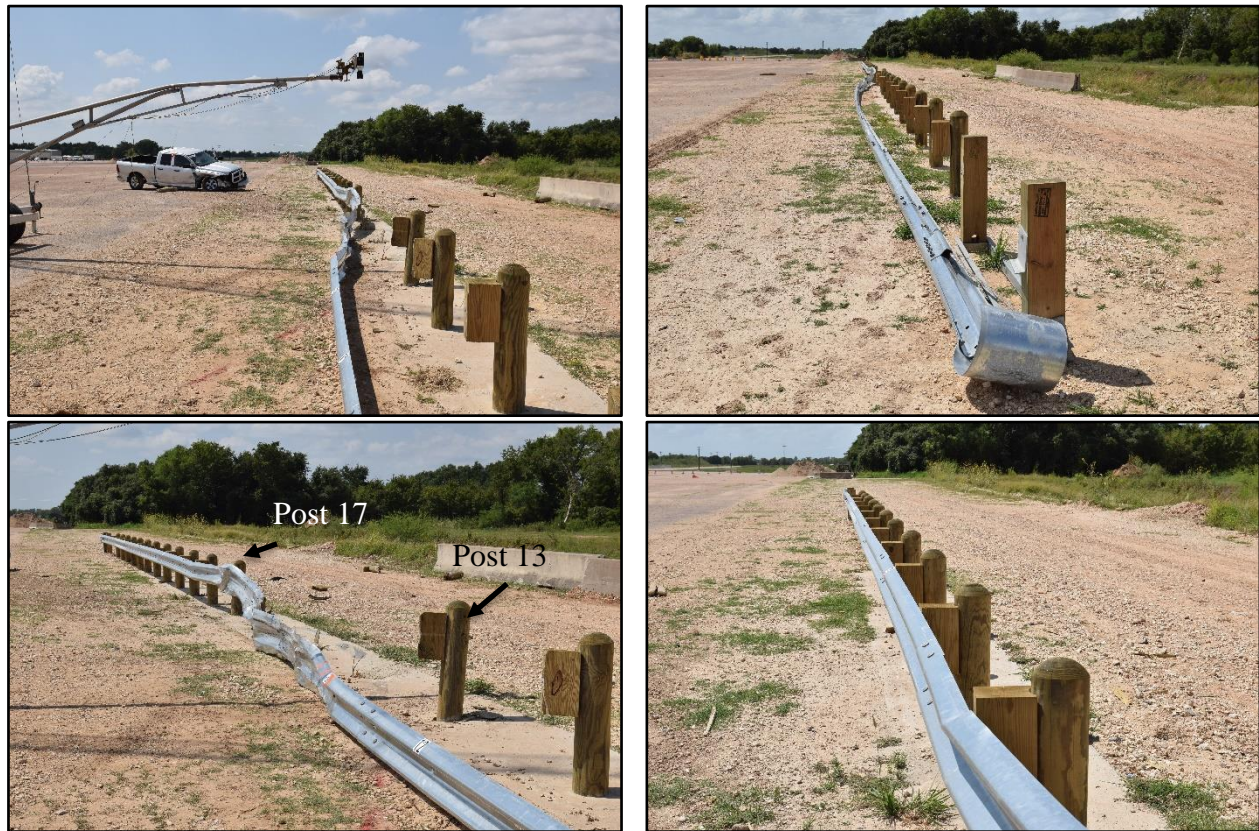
TxDOT W-Beam Guardrail with 7½-inch Diameter Round Wood Posts in Concrete Mow Strip after Test No. 469689-4-1.
